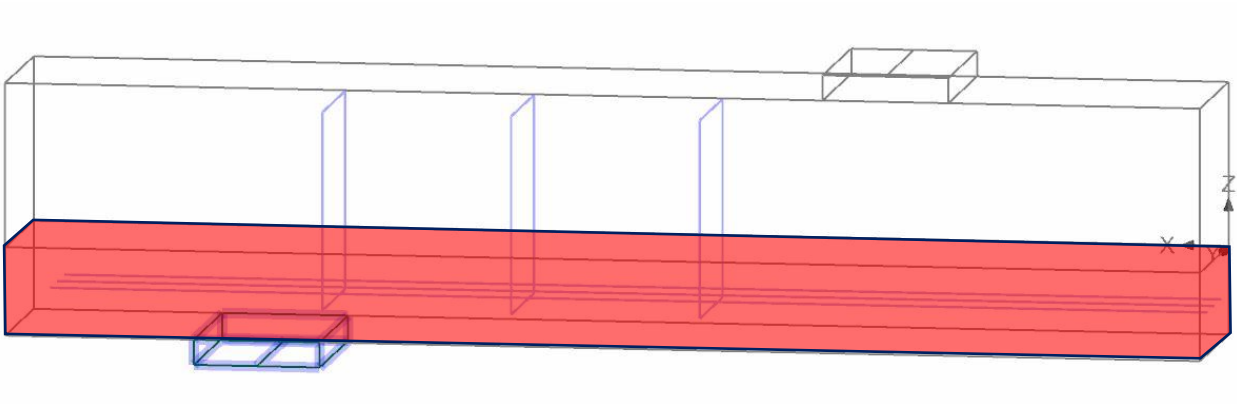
ATENA model of Reinforced Concrete Beam with 70mm SHCC layer in the tension zone (marked in red) and 31mm reinforcement cover.
